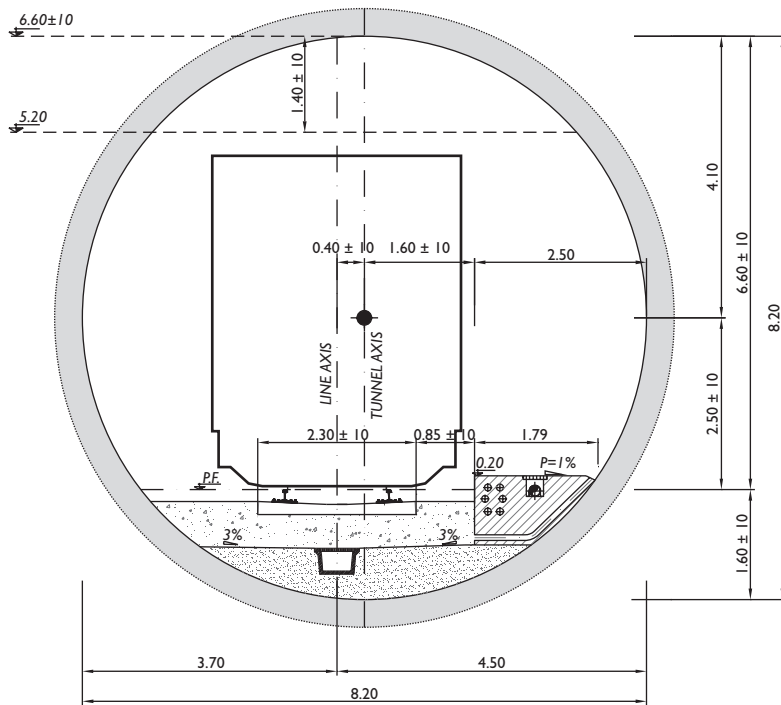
Example of a typical internal section of a tunnel for a single-track railway (Italferr, 2004).
